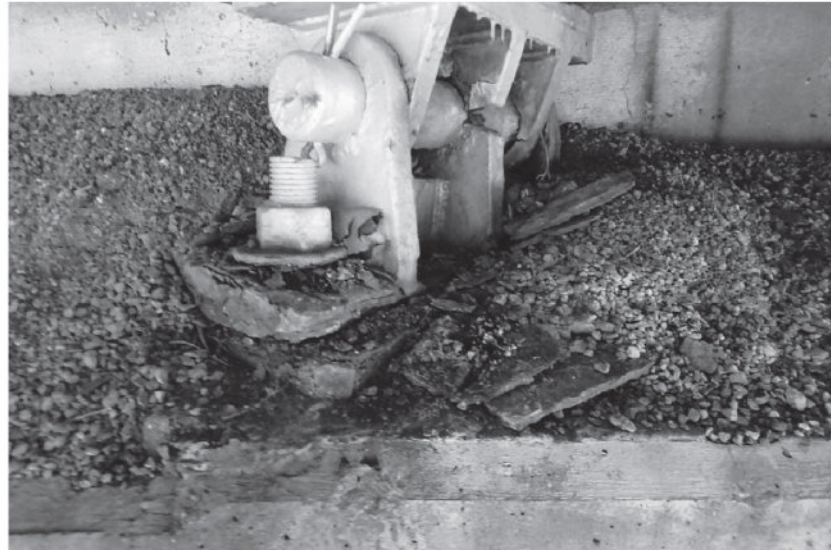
HEAVY CORROSION AND EXCESSIVE ASPHALT ACCUMULATION OF CENTER BEARING AT WEST ABUTMENT.
